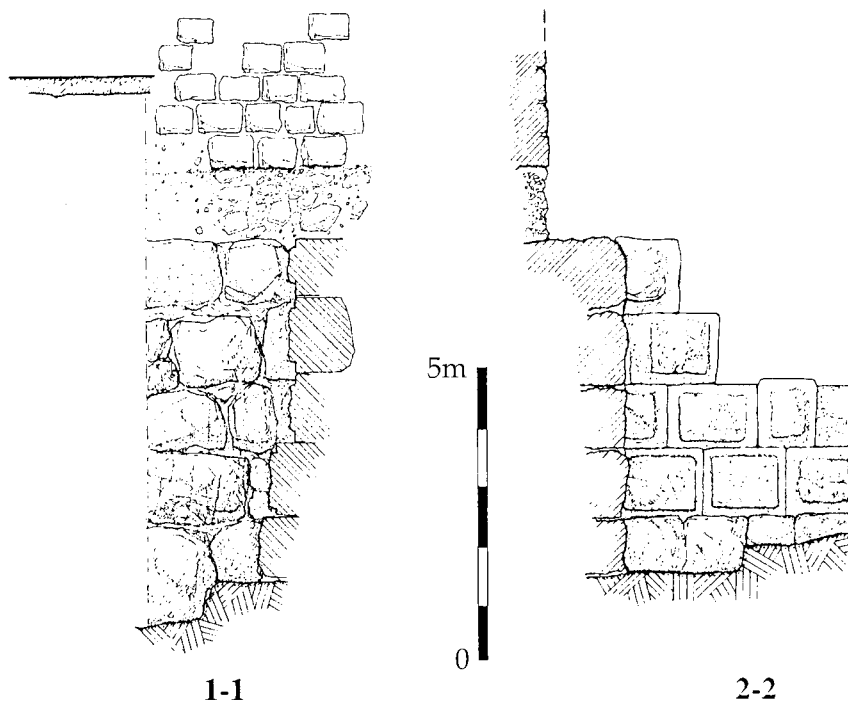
Plan and section of the excavation of Beaucayre Postern (after Seligman 1998).
